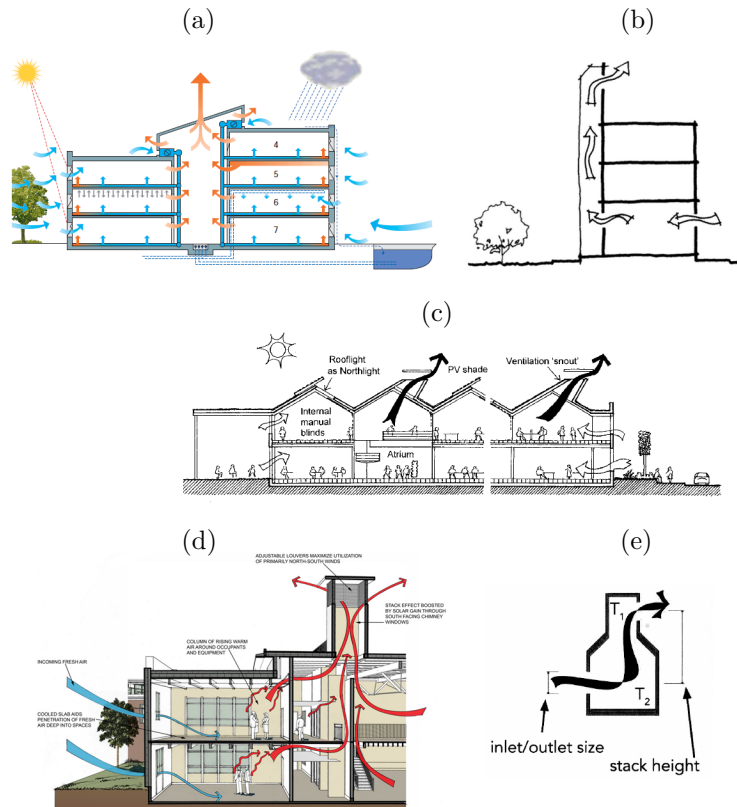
Examples of typical ‘airflow arrows’ drawn at the openings of a building envelope. These airflow arrows often depict the anticipated or the desired (as opposed to the actual) direction of airflow through openings in the façade. Sketches in the figure are taken directly from: (a) CIBSE AM10 (CIBSE, 2005), (b) Ward (2004), (c) Thomas (2006), (d) Archdaily (2011) and (e) Lam *et al.* (2006).
